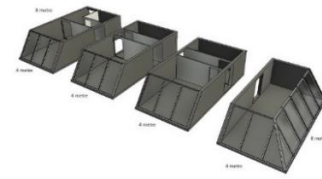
Room modules perspective view, wall interior structure and layers, building views
